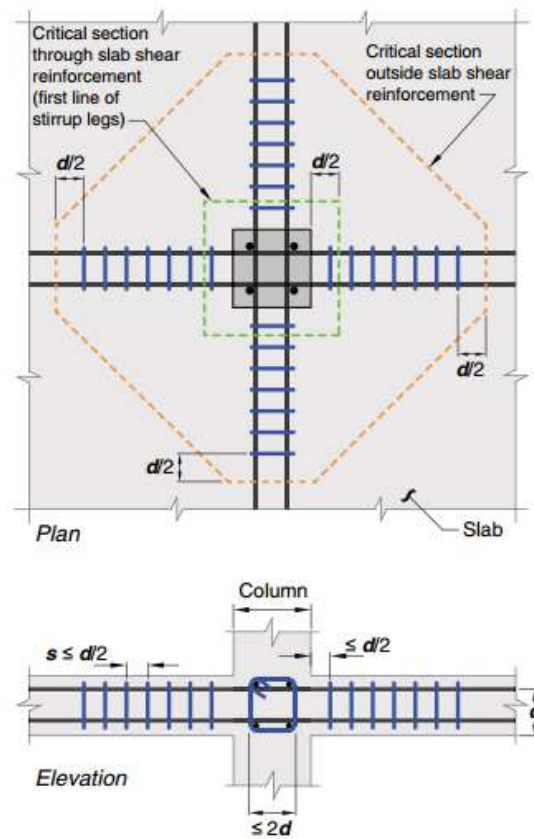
(d)—Arrangement of stirrup shear reinforcement, interior column.
